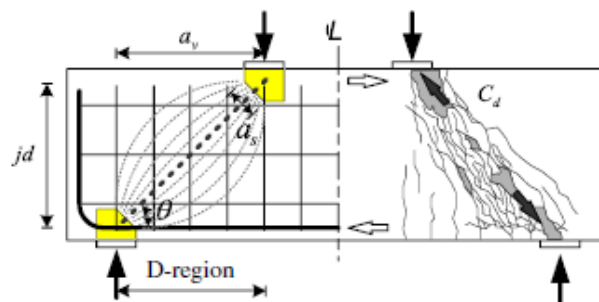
Shear transferring mechanism and crack pattern of the deep beam.
